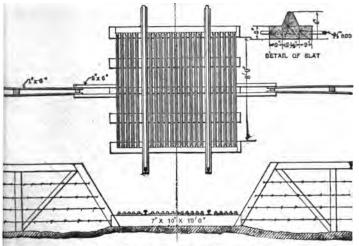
CATTLE-GUARD WITH WOODEN SLATS.
